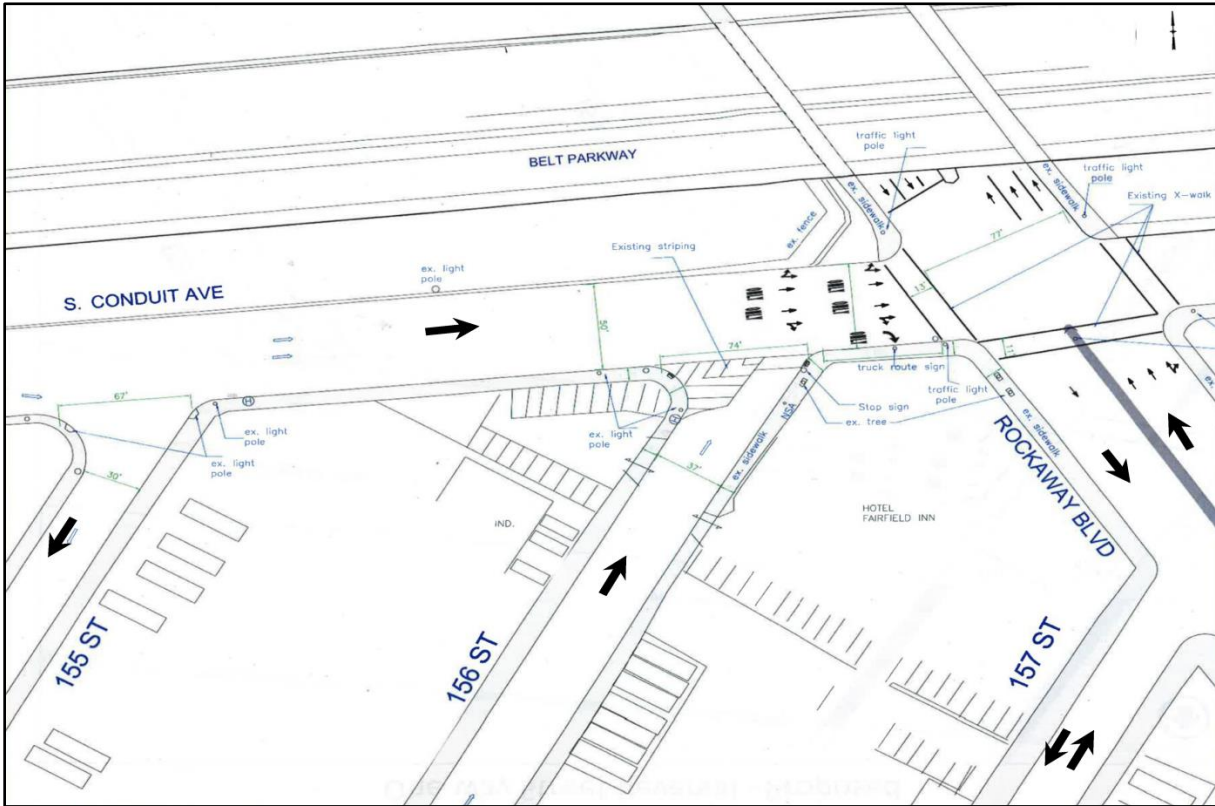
South Conduit Avenue between 155<sup>th</sup>/156<sup>th</sup> Streets
